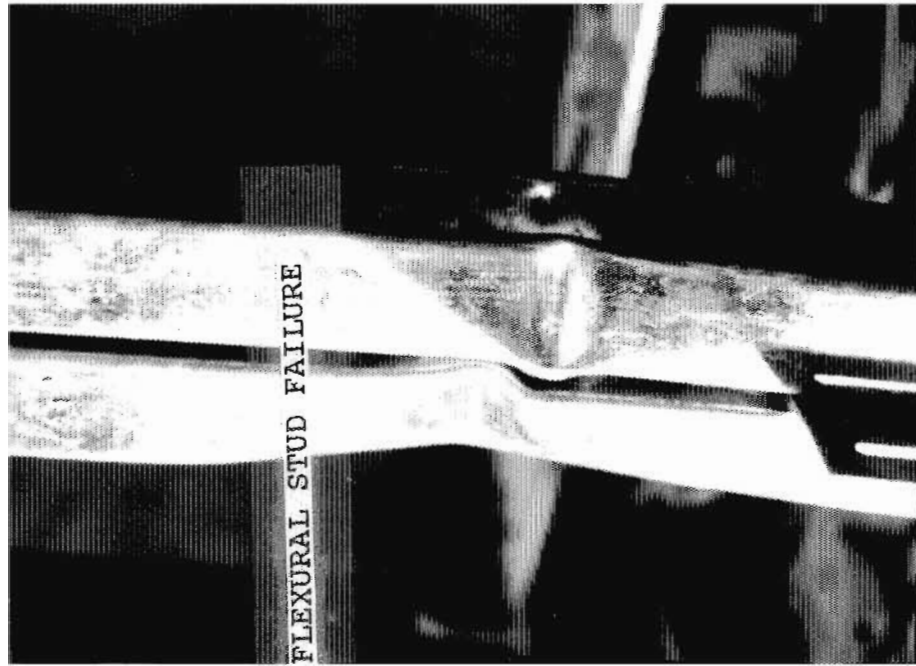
STEEL STUD FLEXURAL FAILURE -
